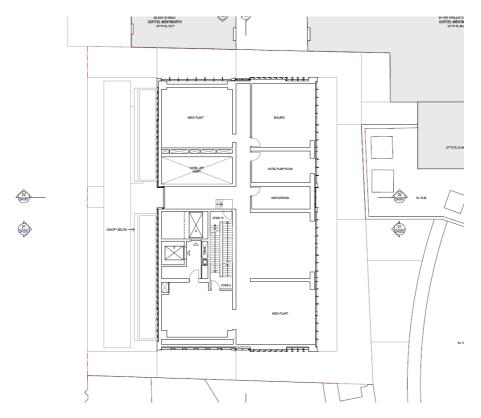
| Proposed level 13 (Source: Woods Bagot)
